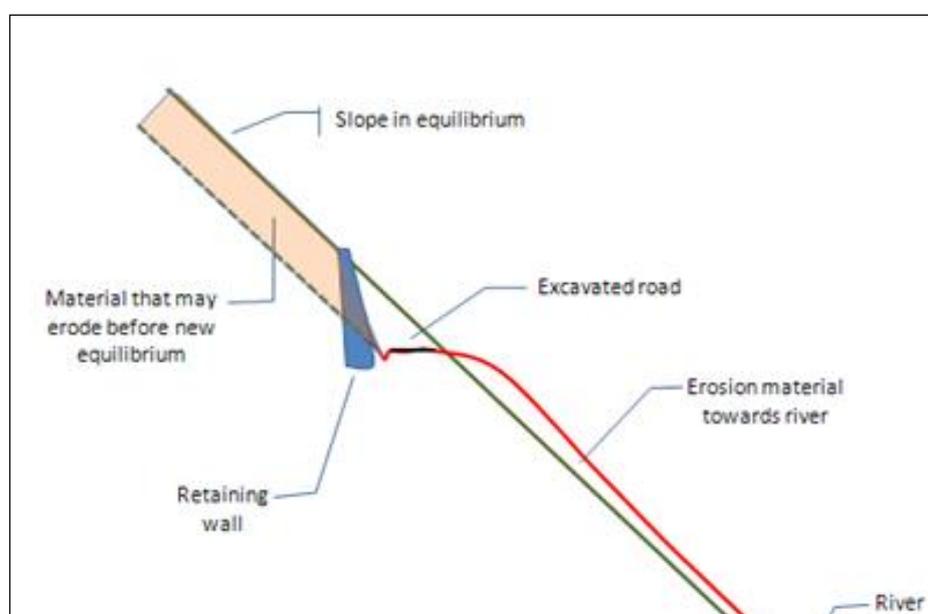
Schematic representation of causes of current erosion due to new road and position of recommended retaining wall.
